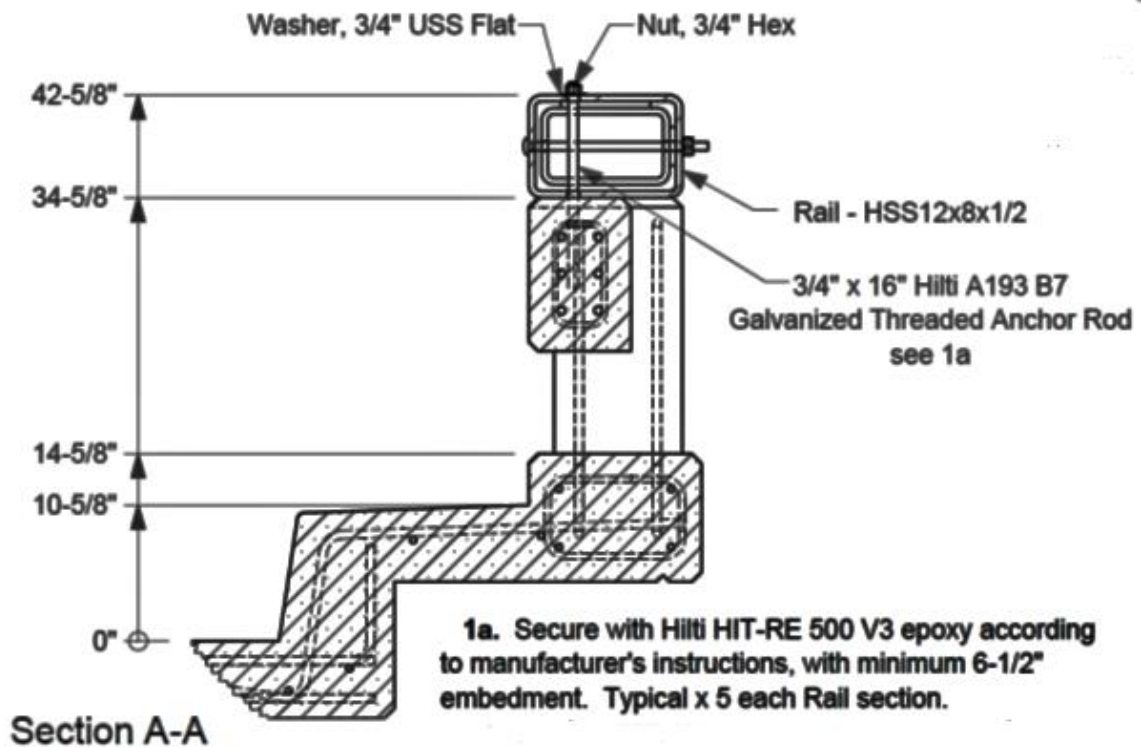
Details from drawing SC15A-60-24P solid concrete parapet with aluminum hand rail (to be removed)
